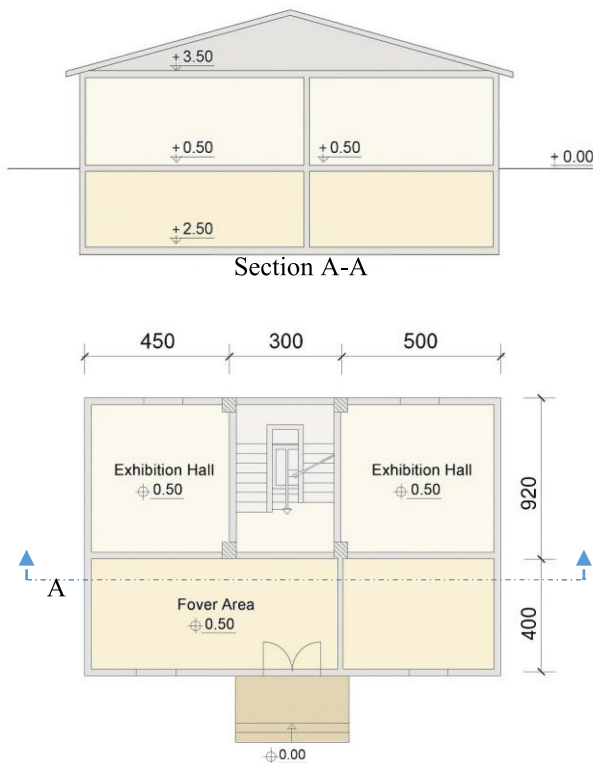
Plan scheme and schematic elevation of the scenario case building.
